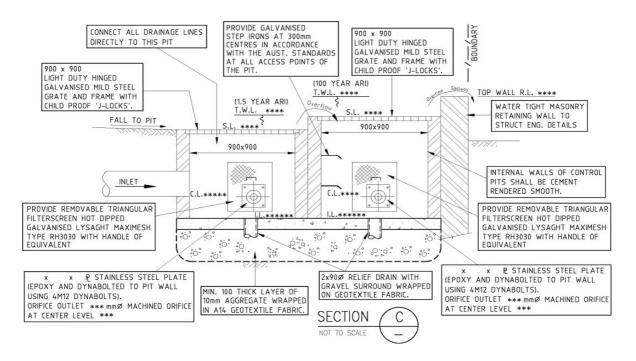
Concept Section of Primary and Secondary Outlets (after UPRCT, 2005)
